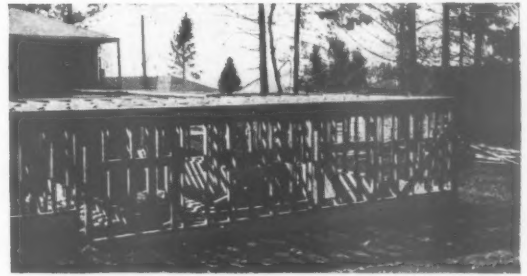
(left). Isometric sketch of platform frame construction, and above (Fig. 6) a small house when the frame has reached first floor level.
